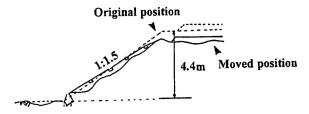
Typical damage to embankment with facings; embankment along JR Sanyo Line between Hyogo and Shin-Nagata Stations (Site EM2 in Fig. 2)
